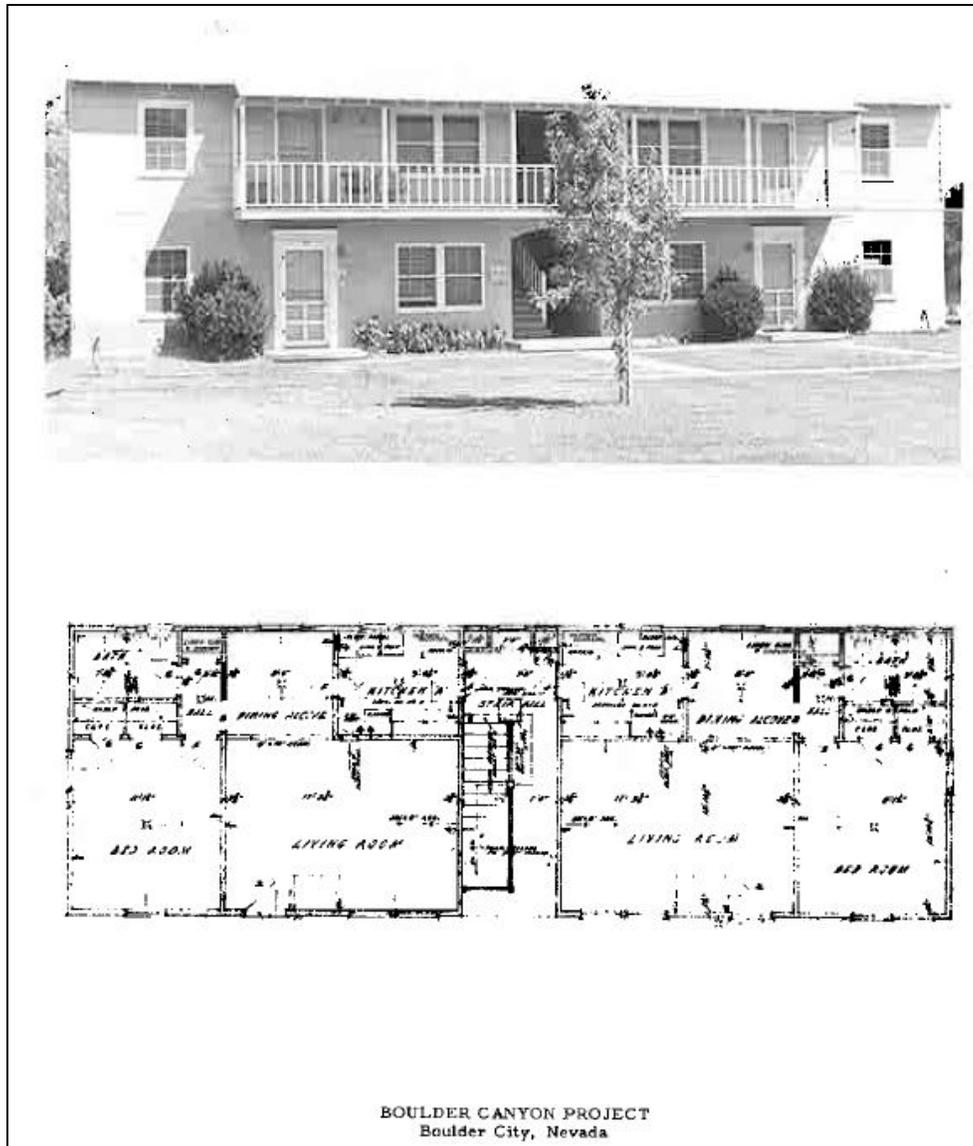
Photograph and floorplan for a two-story apartment building within the Cherry Lynn Apartment complex, ca. 1960 (Image courtesy of the Boulder City HPC).
